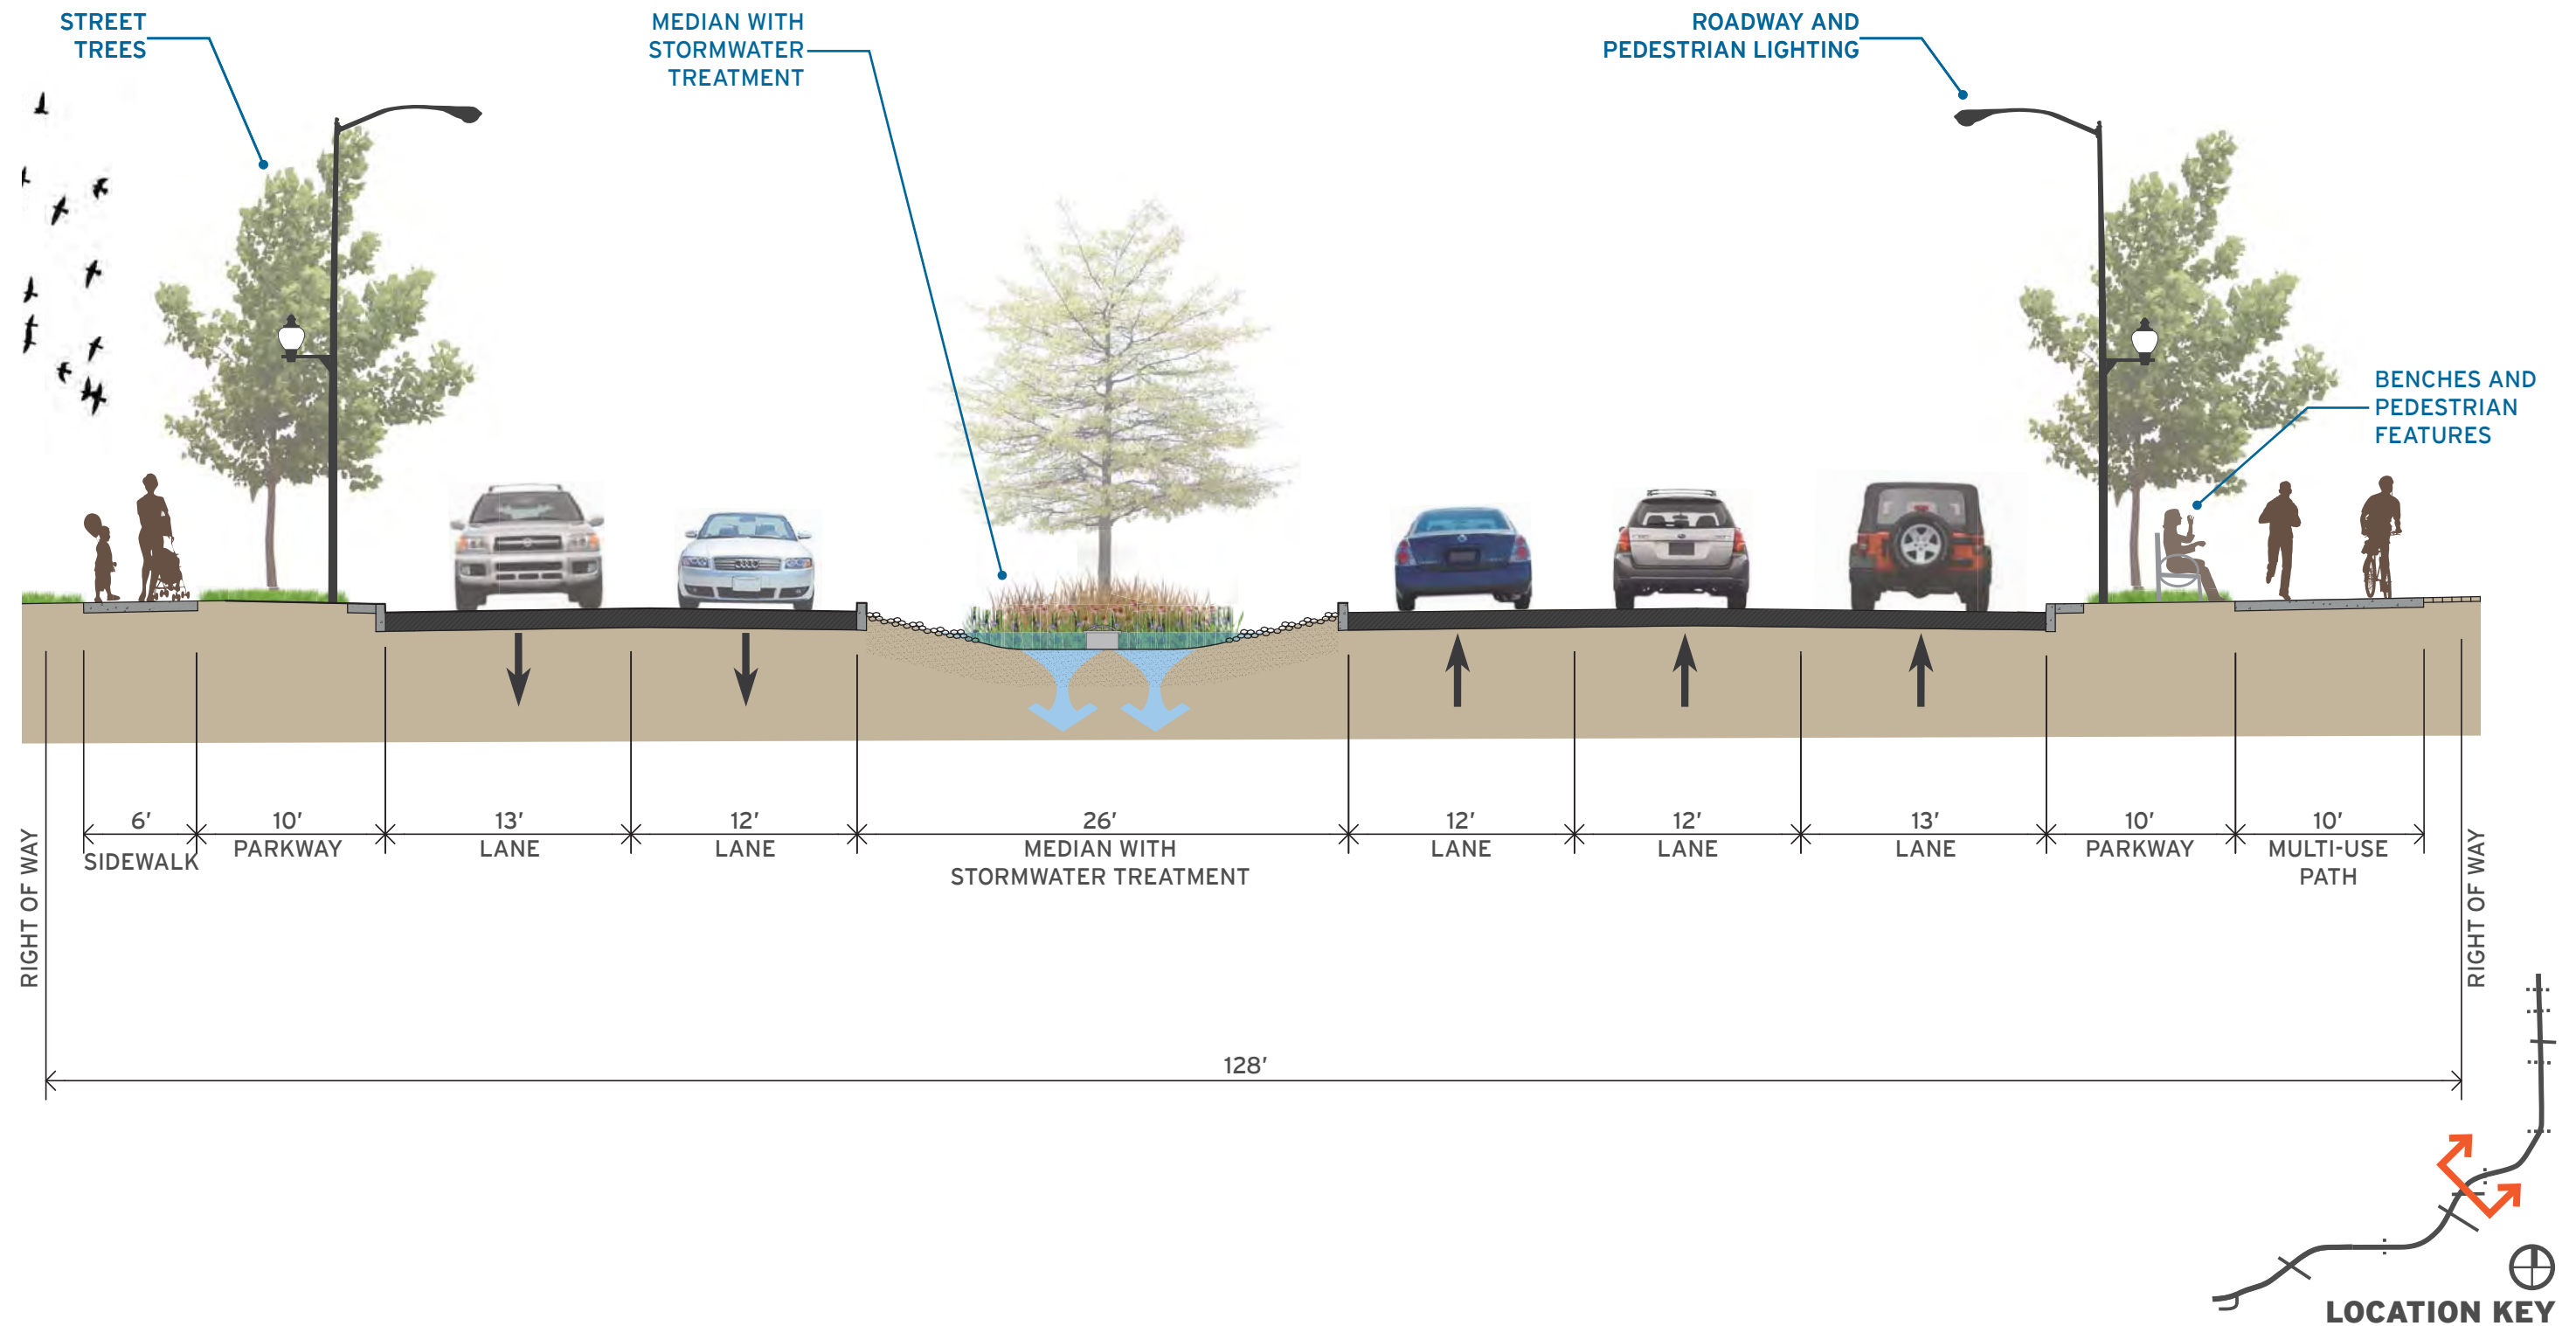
TYPICAL BOULEVARD SIGNALIZED INTERSECTION (CROSS-SECTION)
